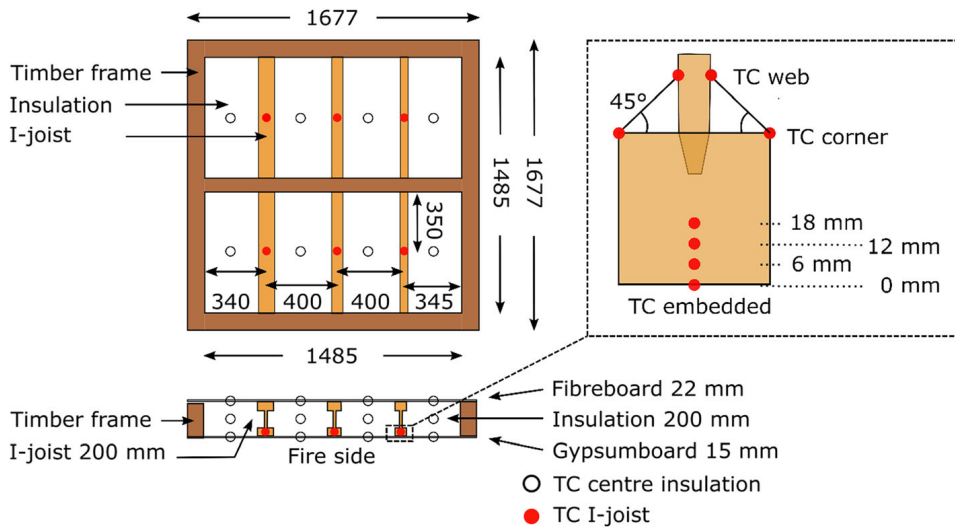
Build-up of test specimen in plan and cross-section, and position of thermocouples. Dimensions in mm.
